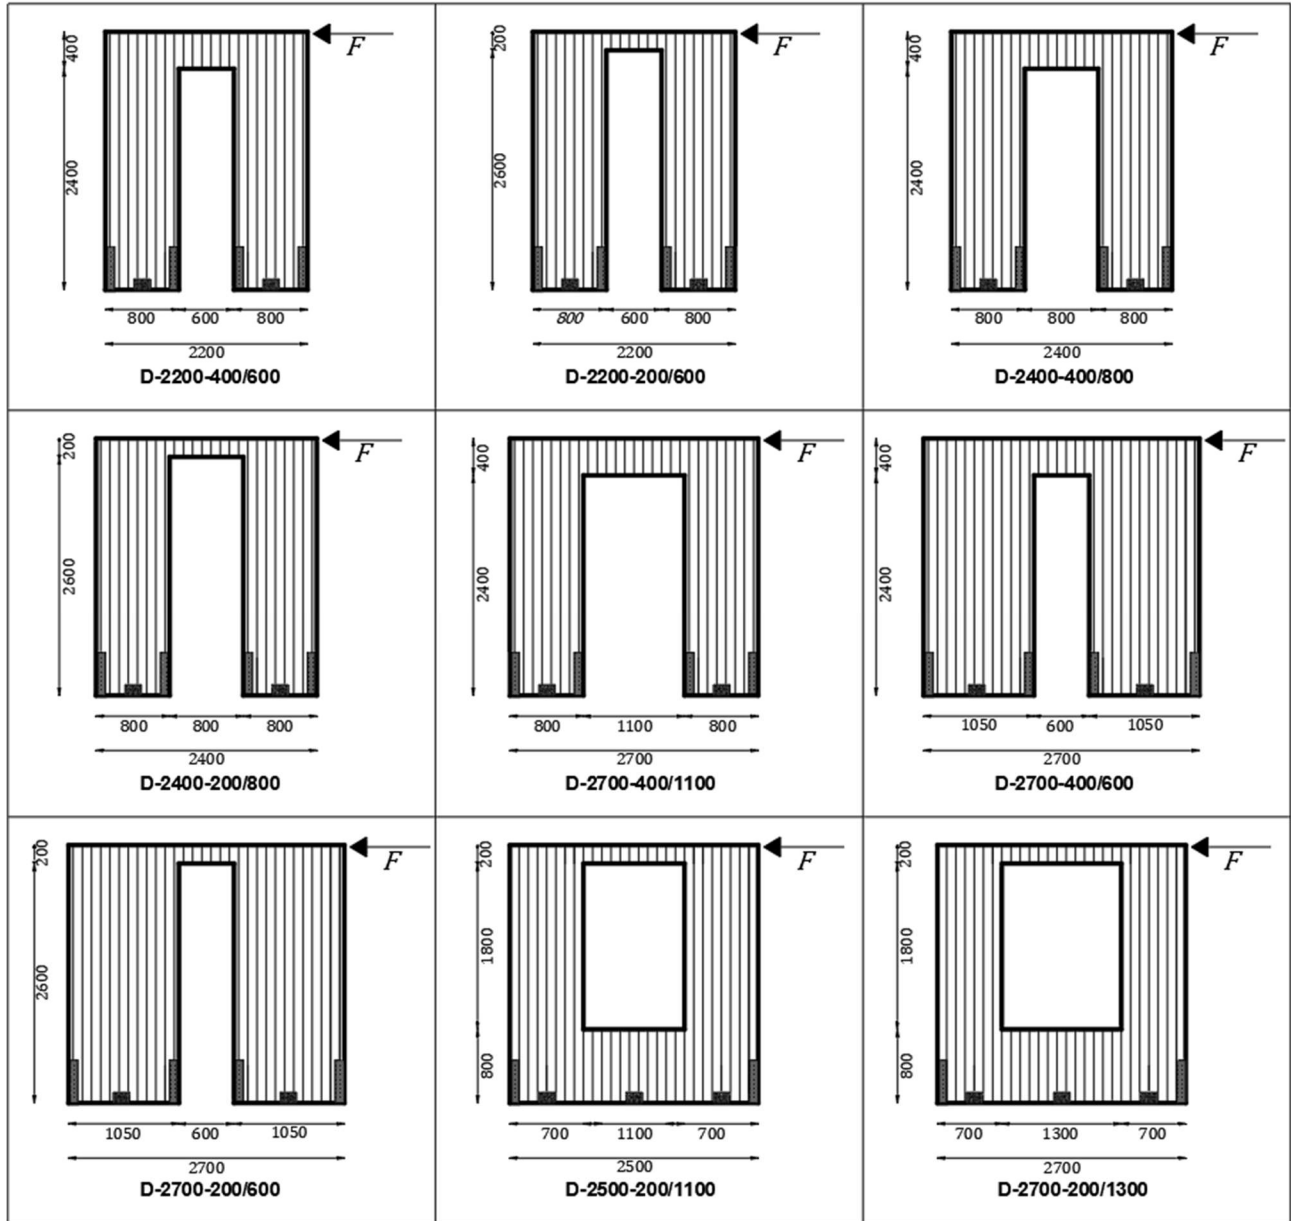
Geometrical dimensions and the opening layout of tested shearwalls
